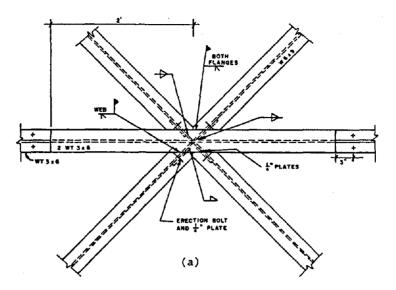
Dowel layout for Jones and Jirsa's steel bracing scheme [2.8,2.9].
